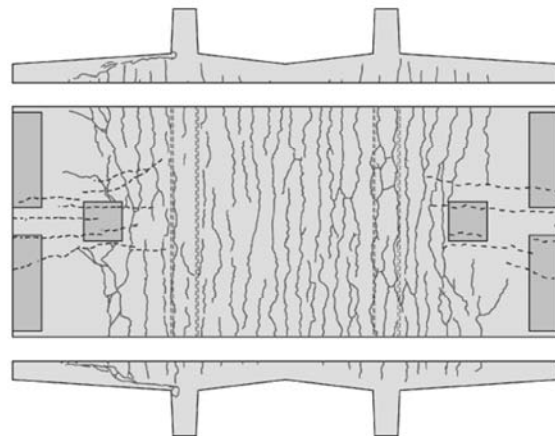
Cracking pattern after test V1 without shear reinforcement (left cantilever) and test V2 (right cantilever), [12]
